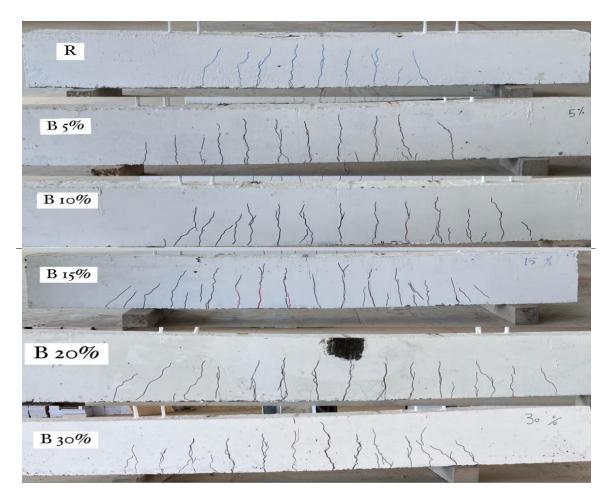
The Pattern of Cracks for Concrete Beams Contained PVC
